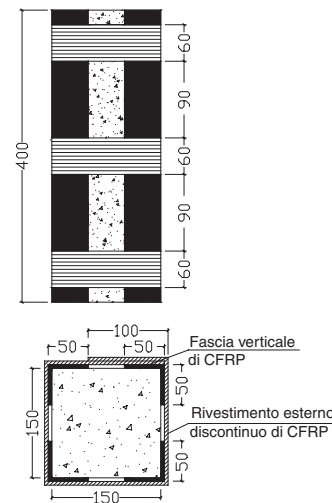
CFRP arrangement for specimens with single horizontal and vertical strips.
